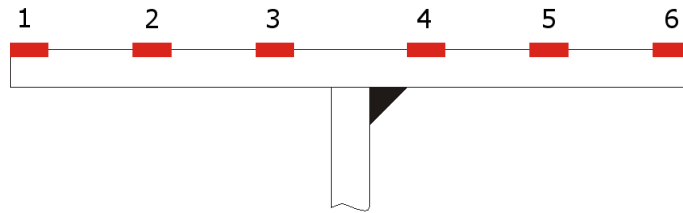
The strain gauge arrangement is shown the cross-section of a plate girder.
